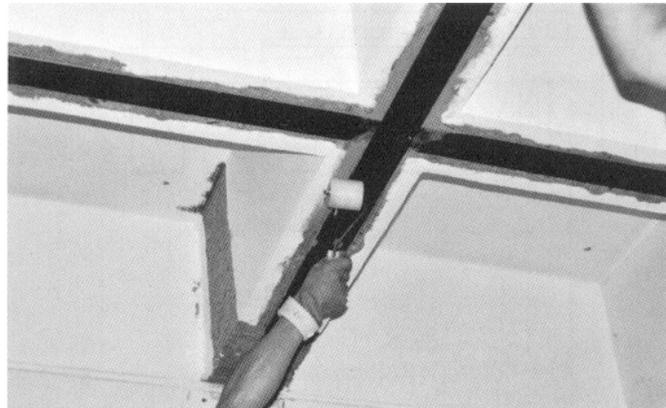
Flexural strengthening of RC beams with CFRP strips.
